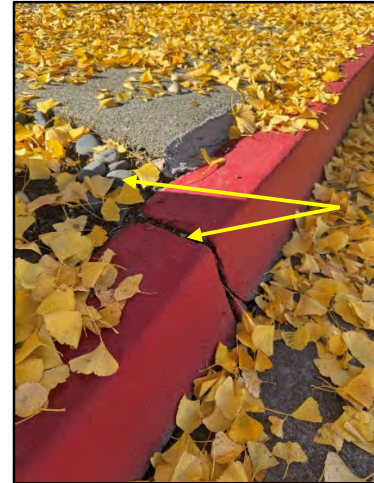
(right). The curb and sidewalk sections were displaced by tree roots (yellow arrows).
